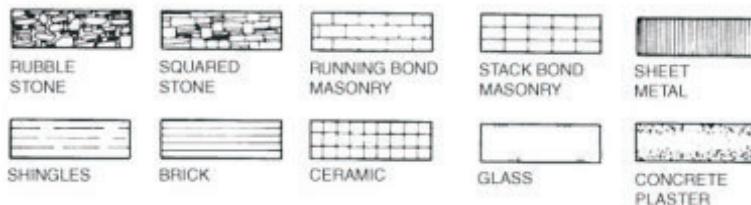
Building material symbols are used in construction drawings to show the finish material for a project, such as a floor or wall. Symbols are also used to show the internal material of construction systems and are used in detail drawings to show the make-up of walls, floors, and ceilings.
